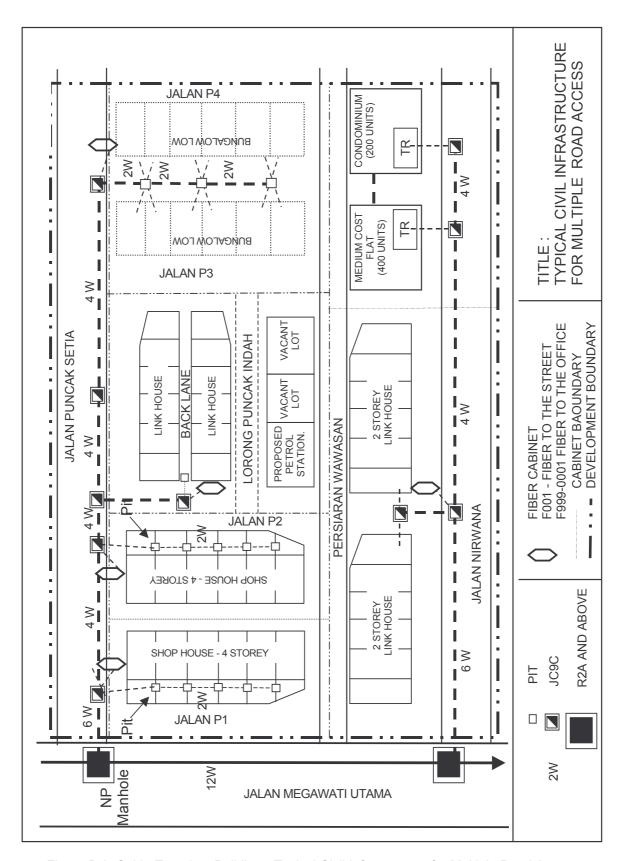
Cable Entry into Building - Typical Civil Infrastructure for Multiple Road Access
